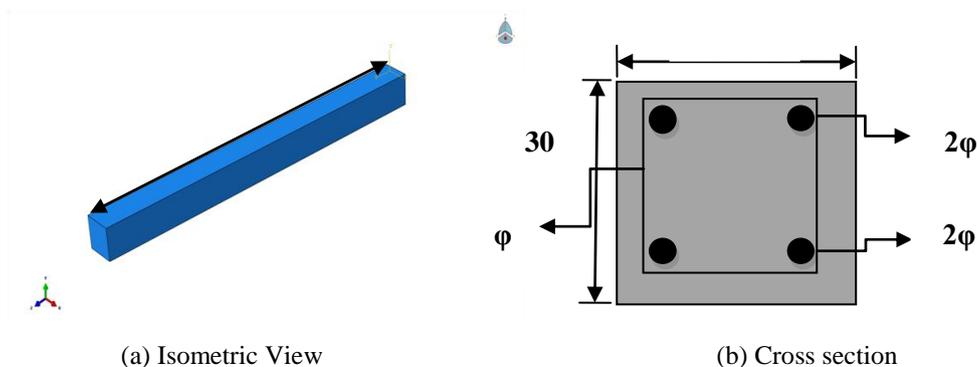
Geometry details and dimensions of concrete Beam in Interior joint
